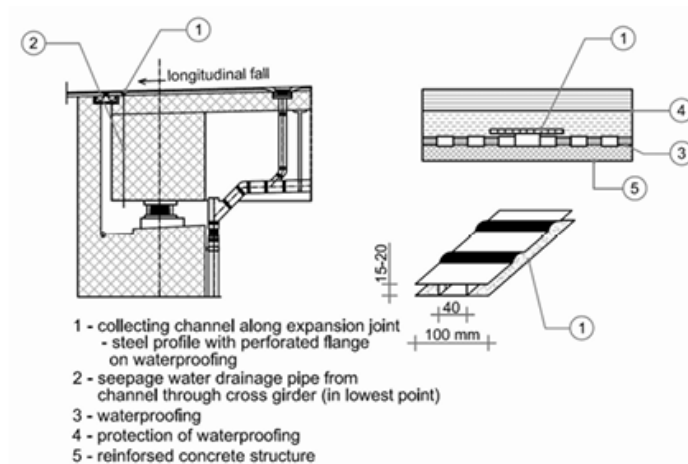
Drainage of seepage water at expansion joint by means of piping in case of bridges without inspection walkway
